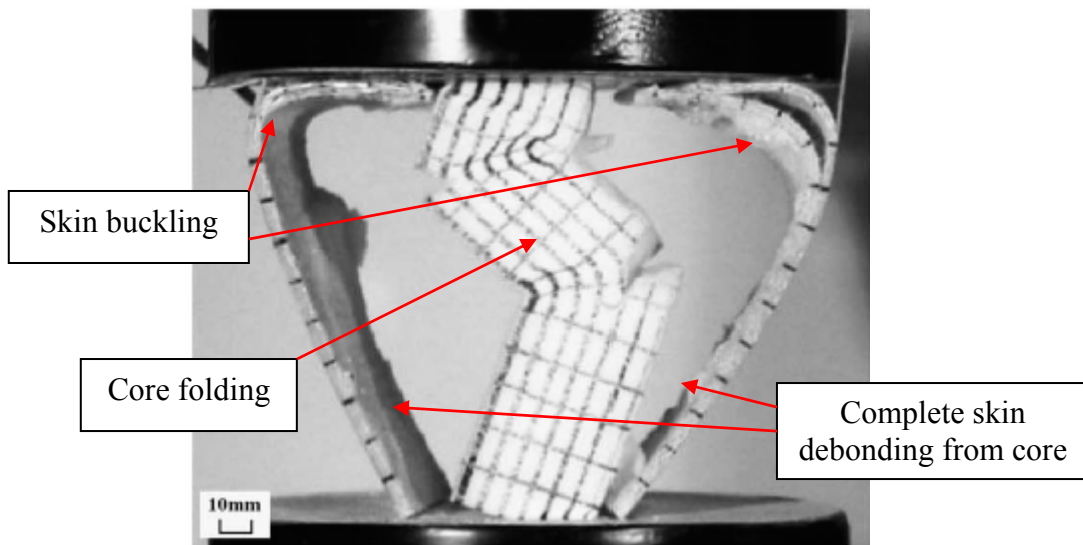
Type-II edgewise failure – Unstable sandwich disintegration with faceplate buckling [112]
